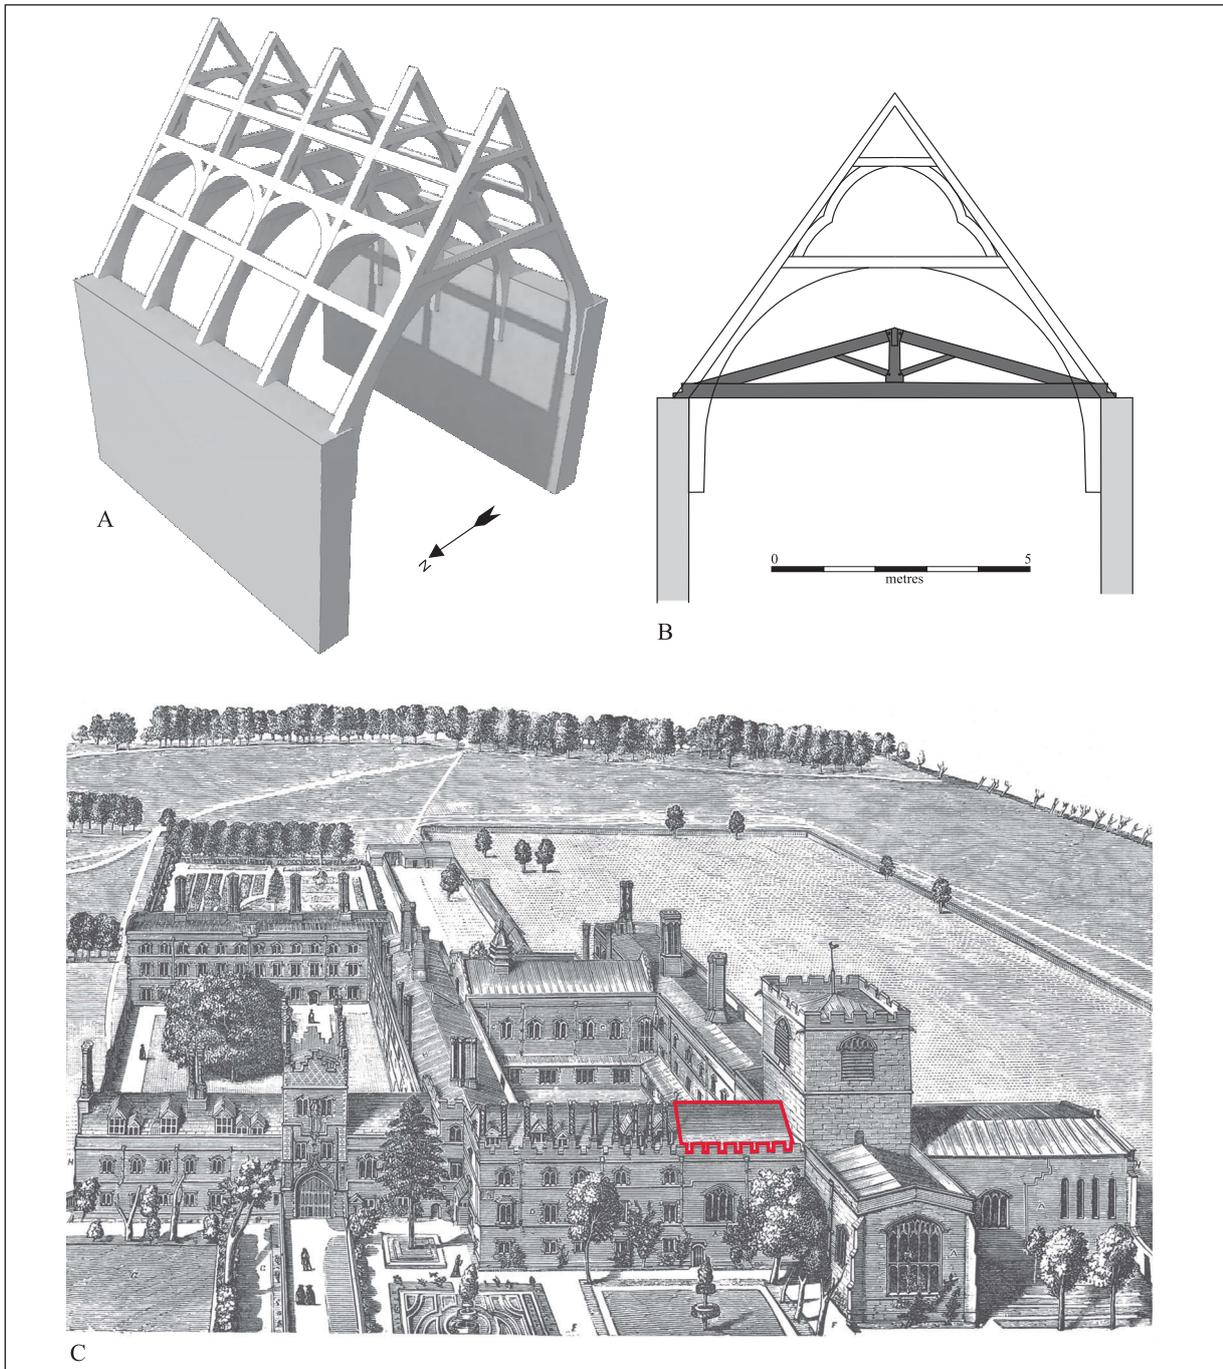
3-D reconstruction of Group 1 roof (A), with comparative elevation showing both the reconstructed and extant structures (B) and Loggan's 1690 engraving of Jesus College (C).
